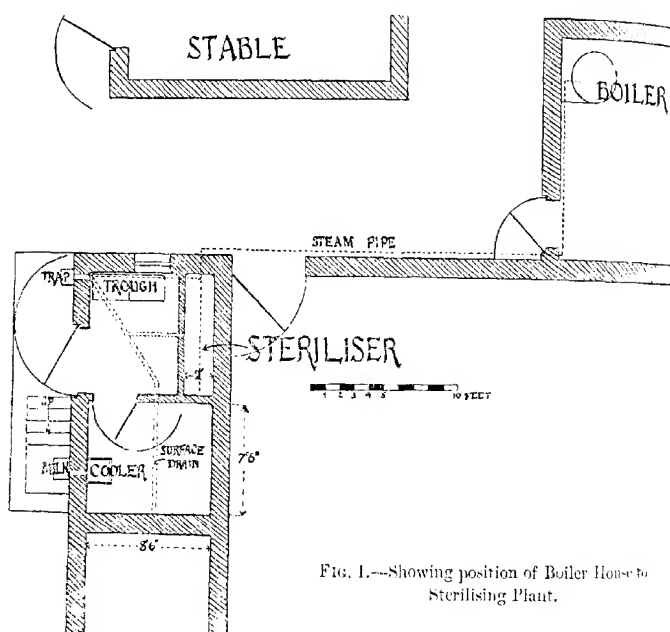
Showing position of Boiler House to Sterilising Plant.
